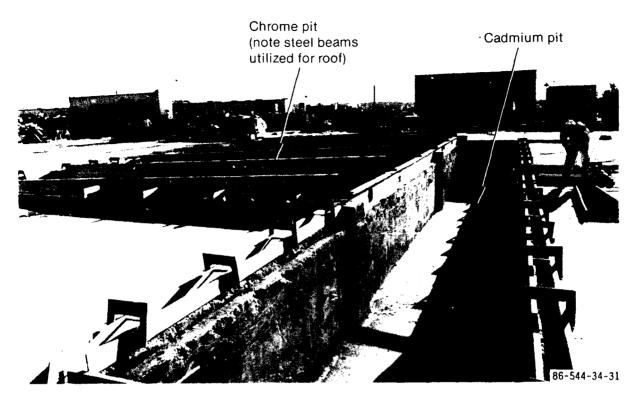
Forms for concrete curbs being constructed around cadmium pit.
